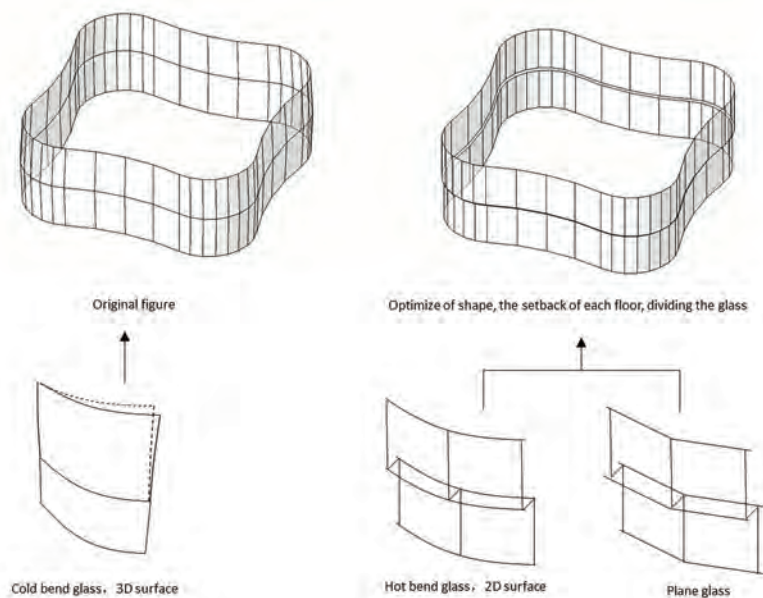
Optimization of façade and curtain wall types (Source: Yu Wang)
